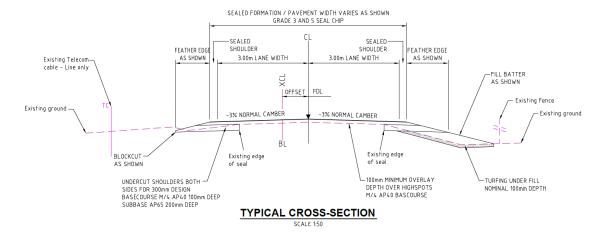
Ashlea Road Area Wide Pavement Treatment Typical Cross Section
